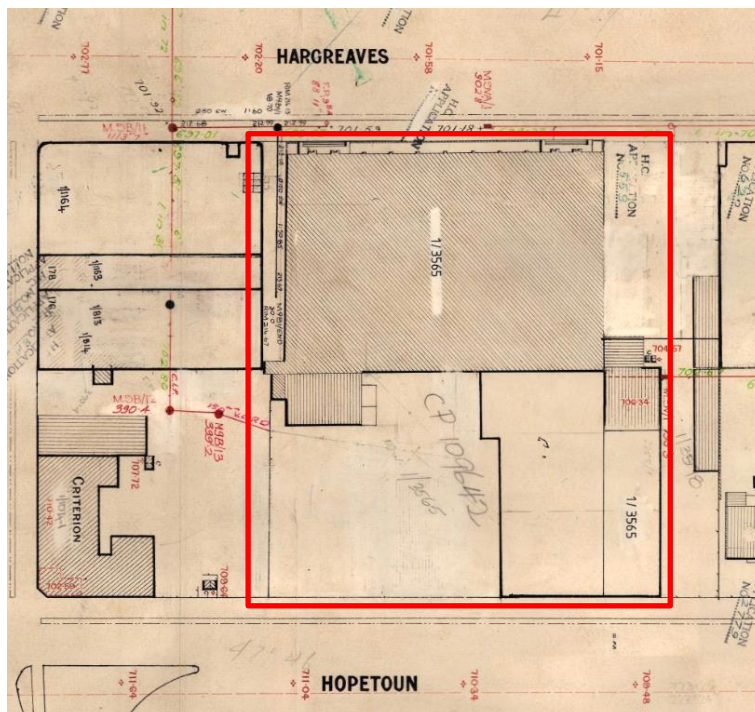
165–71 Hargreaves Street as it appears in the amended sewerage plan from the 1930s. The 1950s Hopetoun Street building is shown without hatching. (Source: Bendigo Sewerage Authority Detail Plan No. 10, c.1930s)
